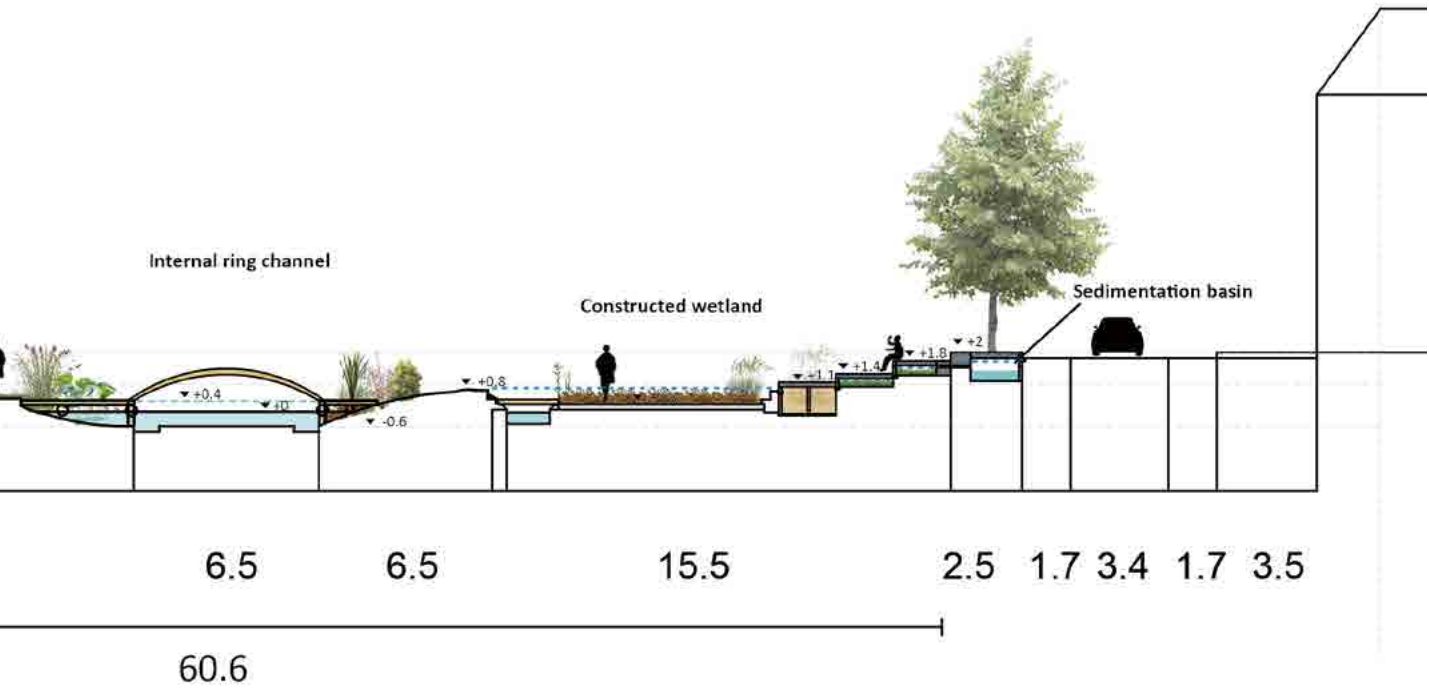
Detailing of constructed wetland cells in Amsterdam School, people can sit on it
